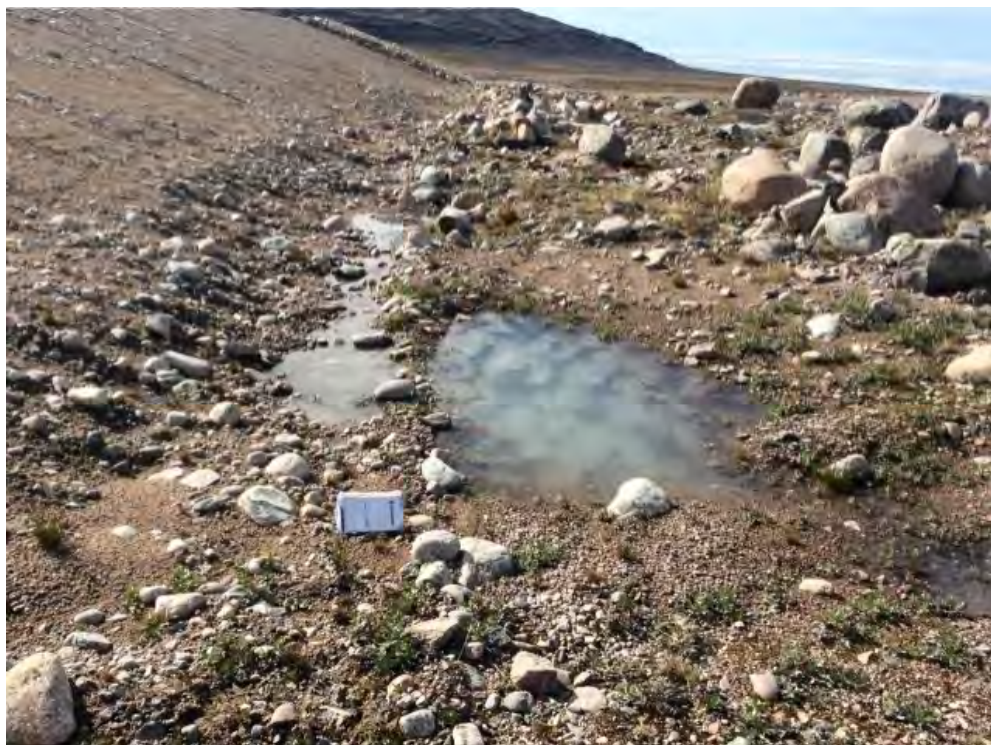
Non-Hazardous Waste Landfill- North toe, Feature Q-Ponded water, facing southwest (Acceptable) (CAM5_Photo23.jpg)
